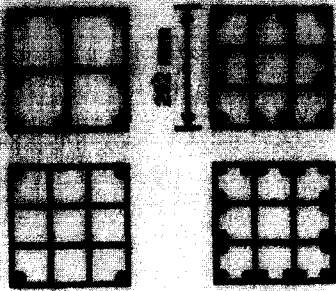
Geometric Details of Welded Reinforcement Grids
